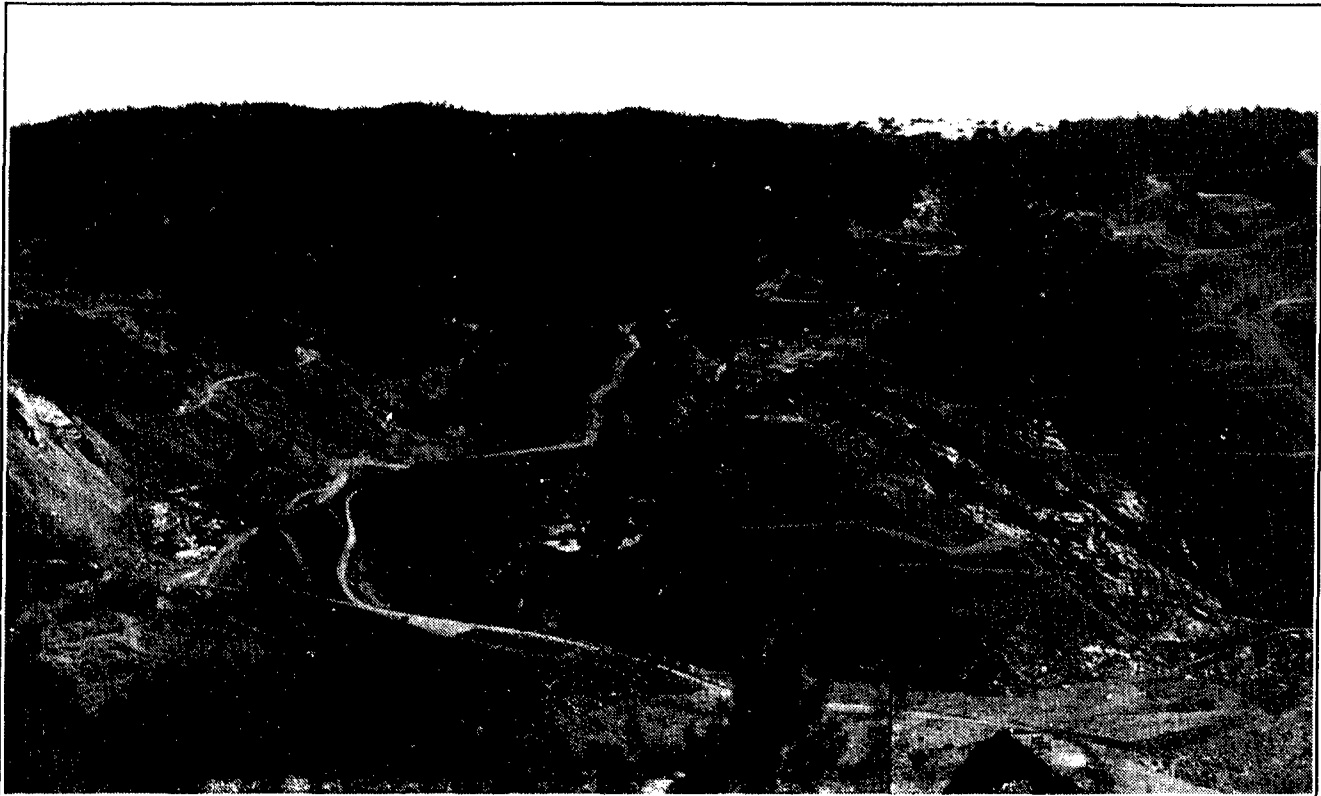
View of Existing Construction Damage in Damsite Area - Eastern Abutment
